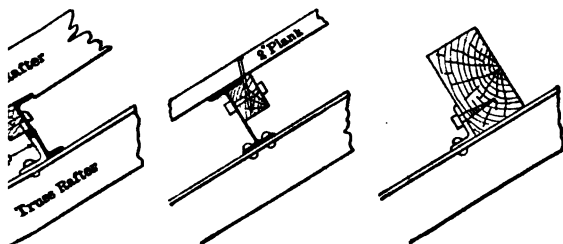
Purlin-connections. Steel Sections with Wooden Nailing-strips
